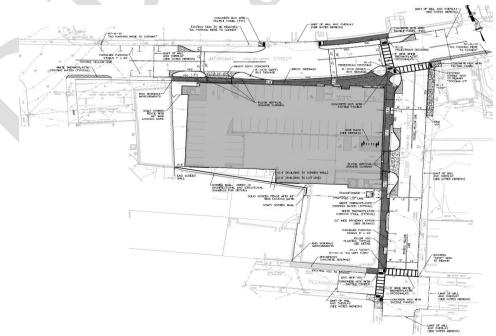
Planned adjustments to on-street parking spaces abutting the new parking garage.
